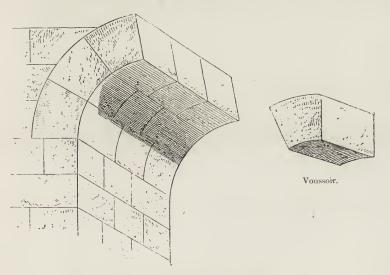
THE ELEMENTS OF ARCH CONSTRUCTION.
